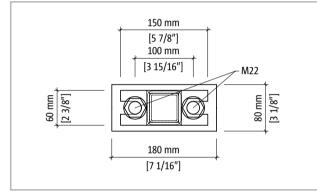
Schöck Isokorb® T Type S-V-D22: Elevation of the product
